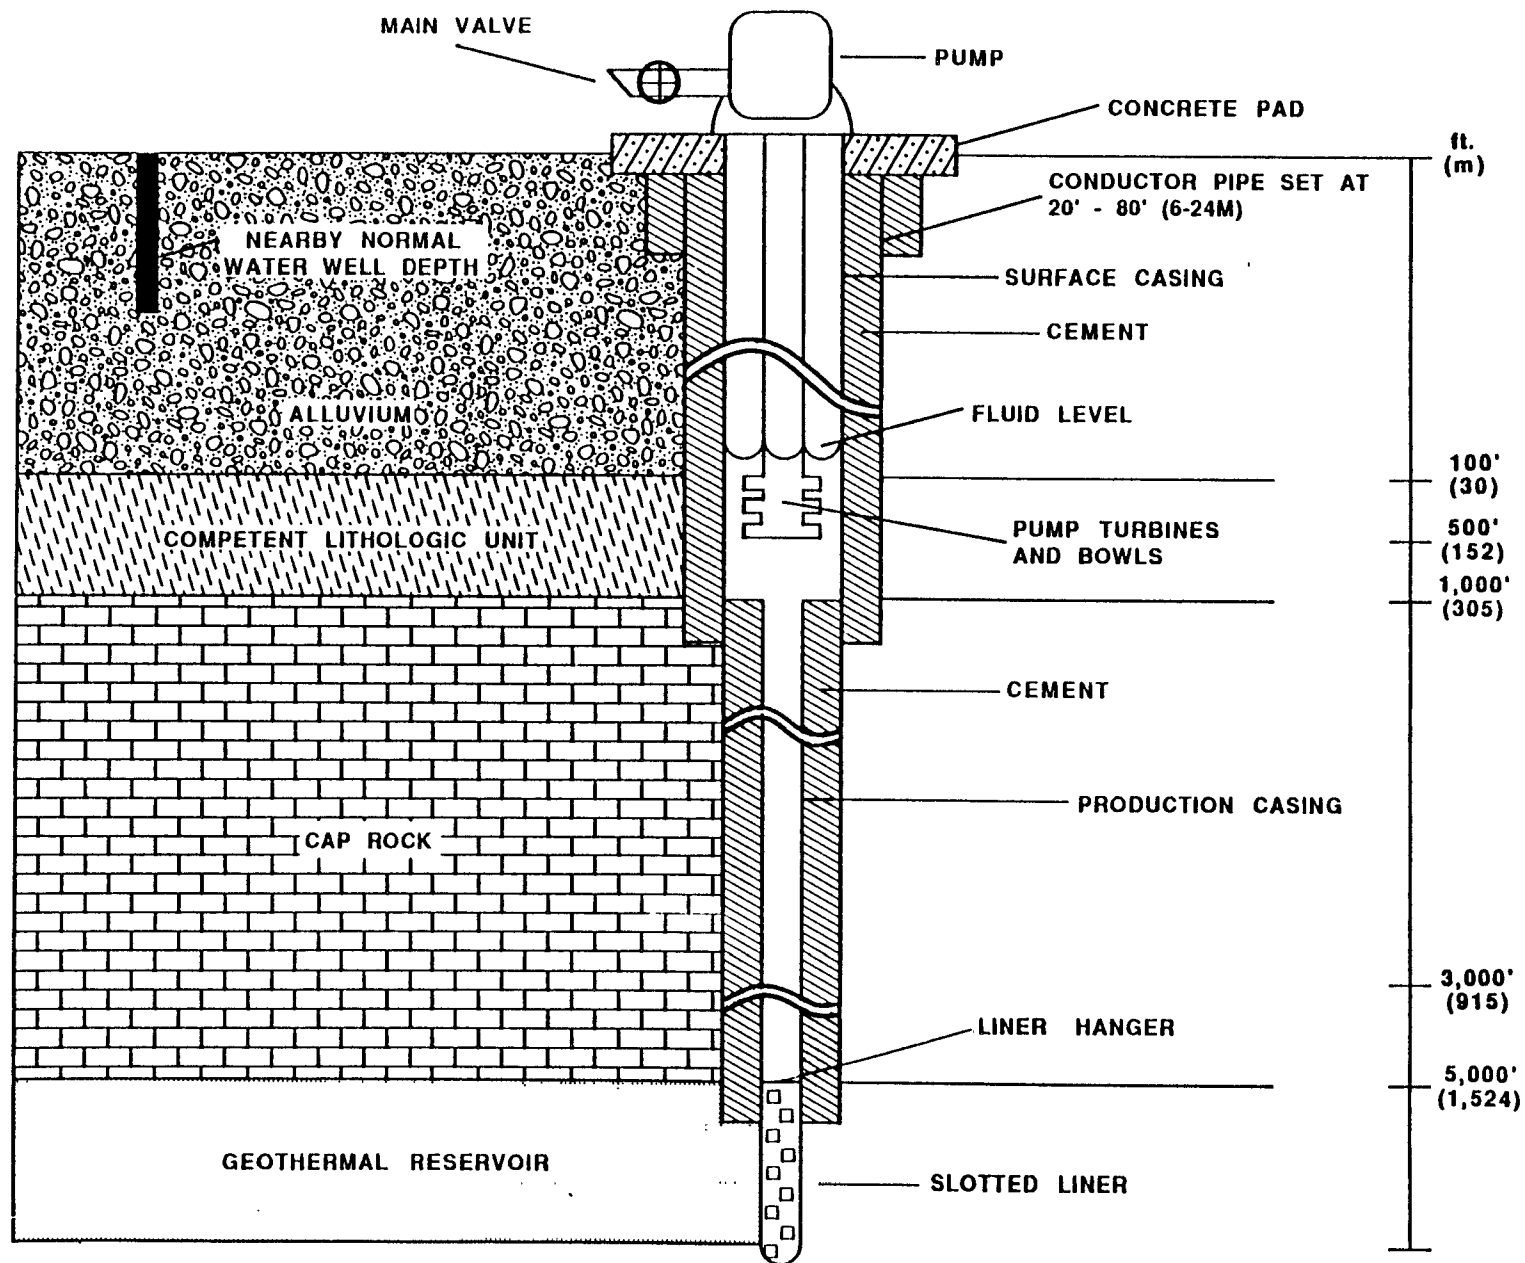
Typical Hydrothermal Well (Source: USDOE 1981)
